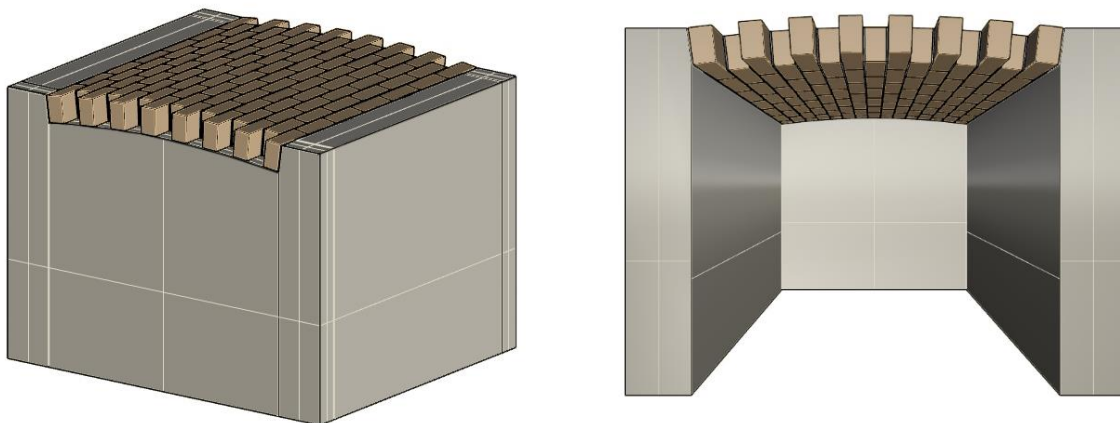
3D Modelling on Rhinoceros 3D of the shallow barrel vault
